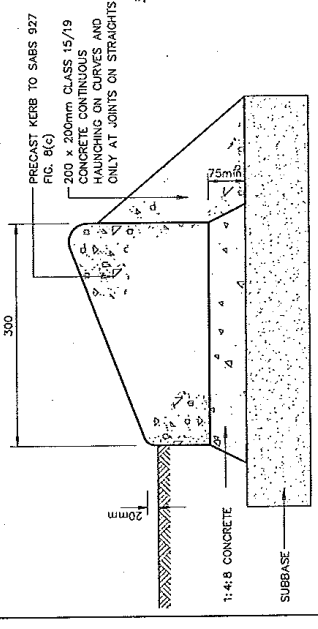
DETAIL OF SEMI-MOUNTABLE KERB (FIG. 7)
